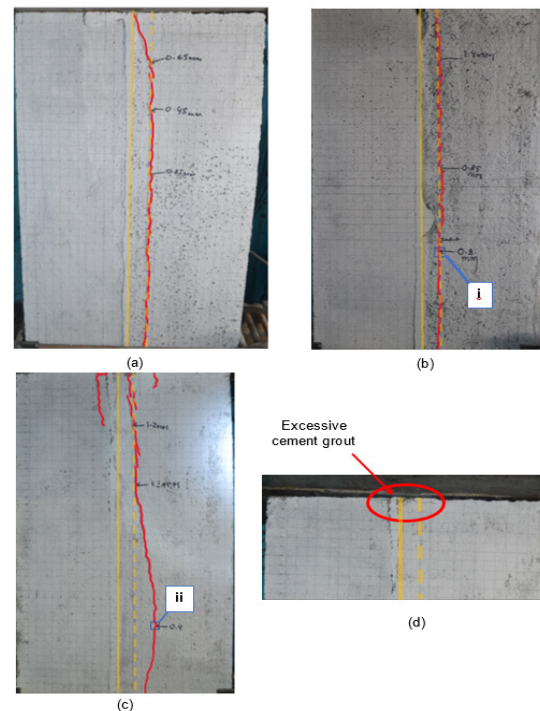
Crack pattern of the Type 1 wall-to-wall connection for specimens (a) T1S1 (b) T1S2 and (c) T1S3. (d) excessive cement grout on T1S3 created additional stress when load was applied
